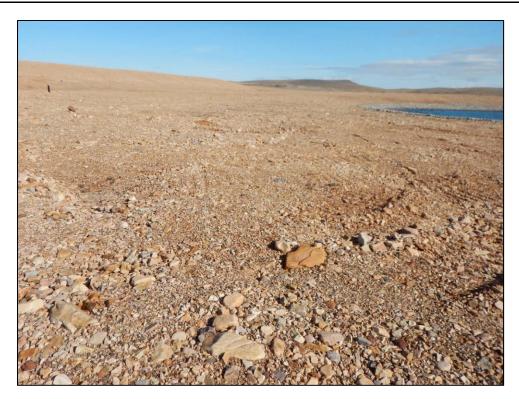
Toe of West Twin Dyke Tailings Cover – View looking northeast.
